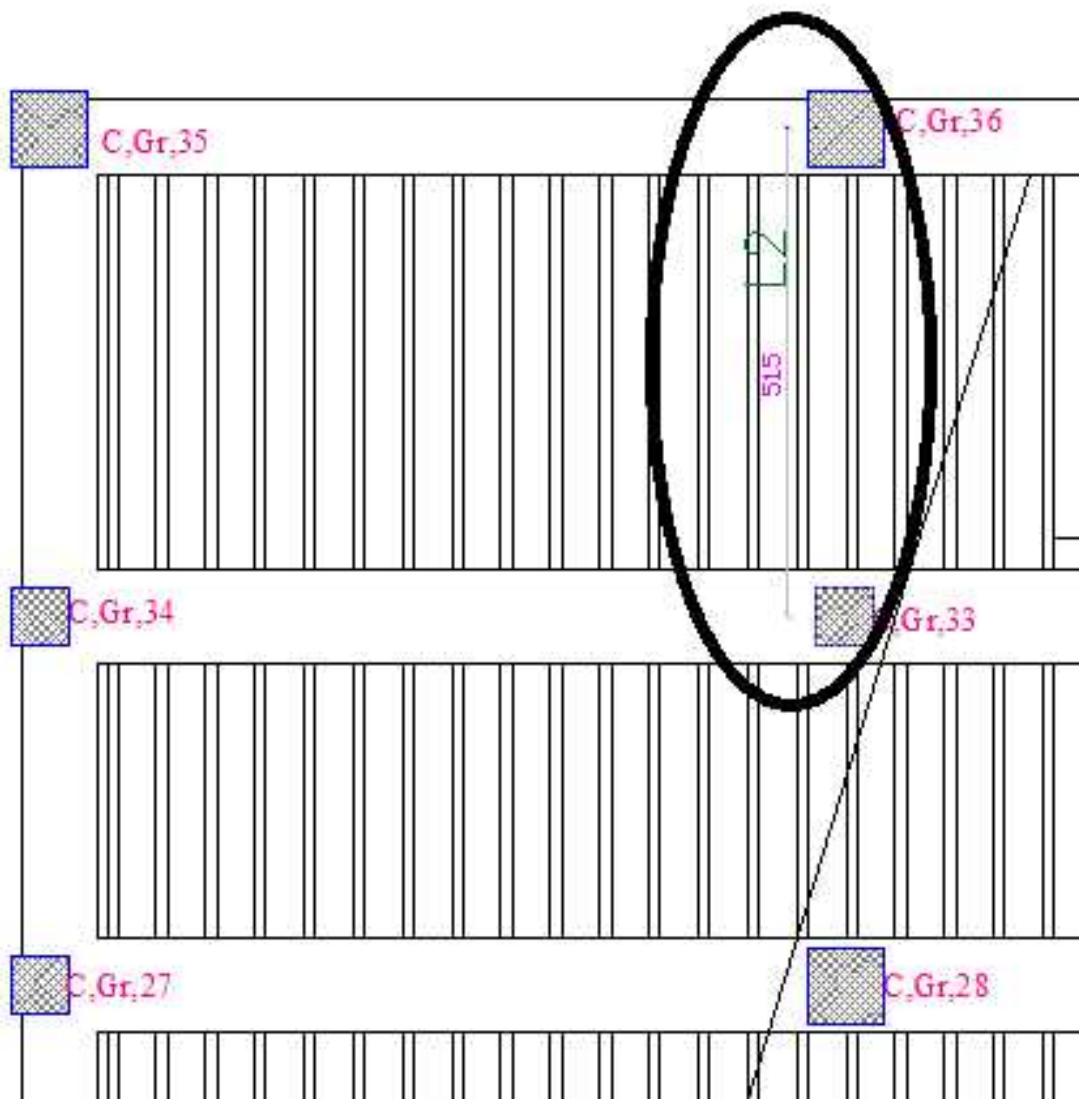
one way Rib slab-exterior plan (R 15-part A)
